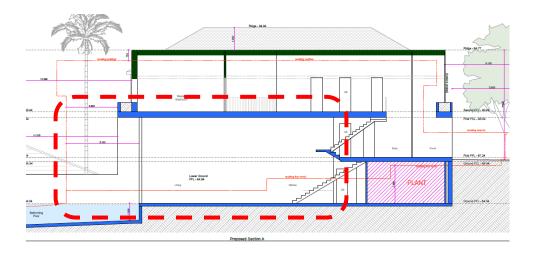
Proposed Section A, demonstrating excessive voids (outlined red). (Source: Stephen O'Connor Architecture, 2022)
